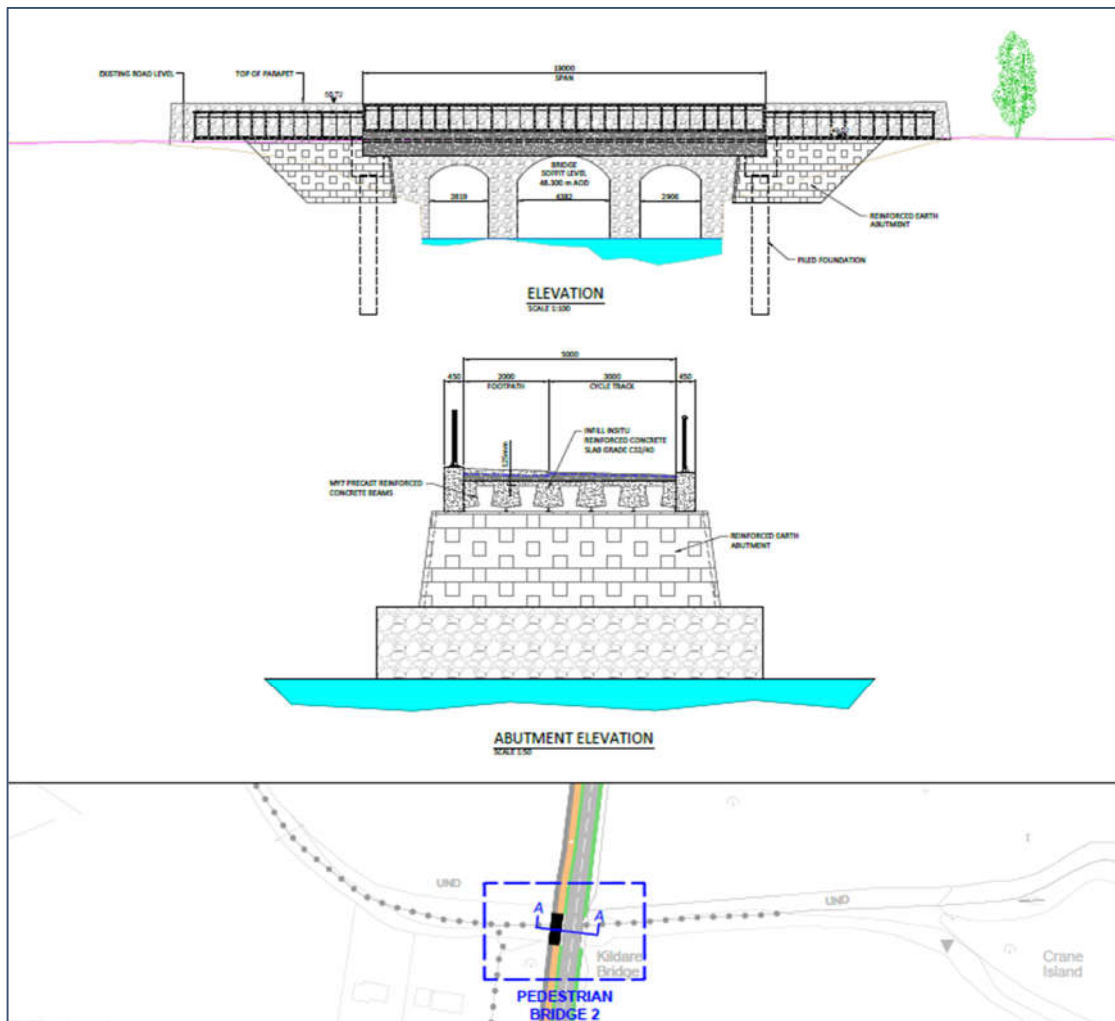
Proposed Kildare Bridge (Pedestrian Bridge 2) – Imagery extracted from Planning Drawings (OCSC, 2022)
